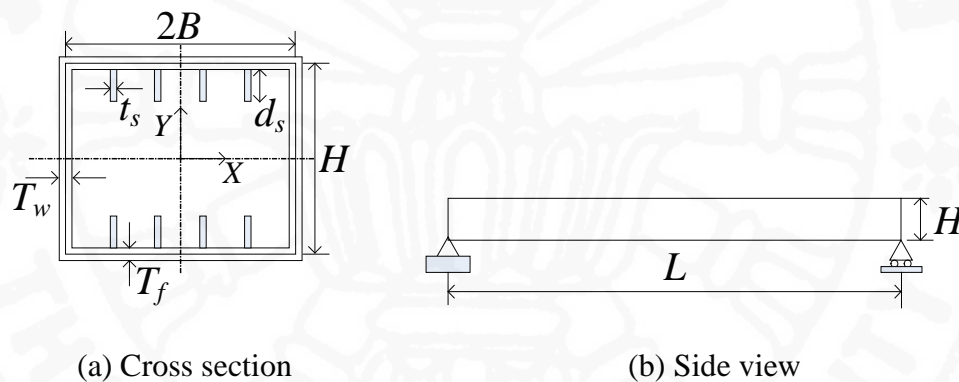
Structural geometry of simply supported box girder with longitudinal stiffeners
